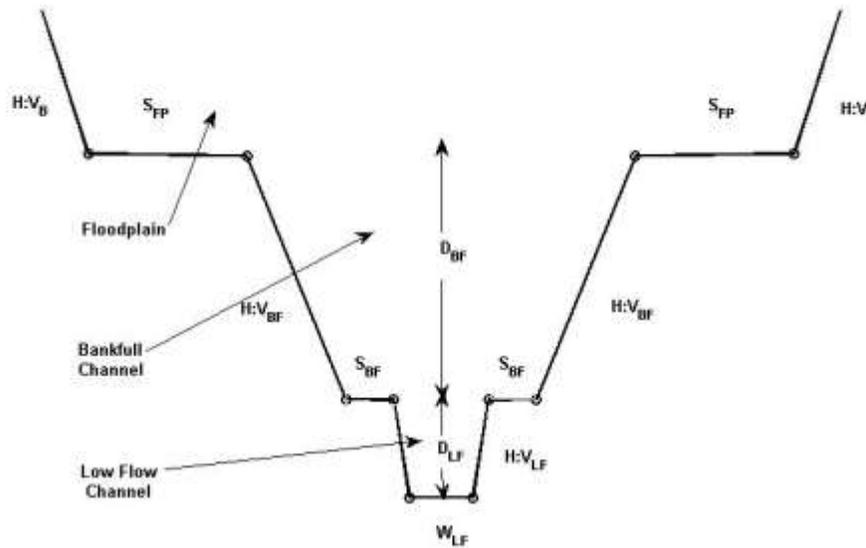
Definition Sketch of a Compound Trapezoidal Cross-Section
